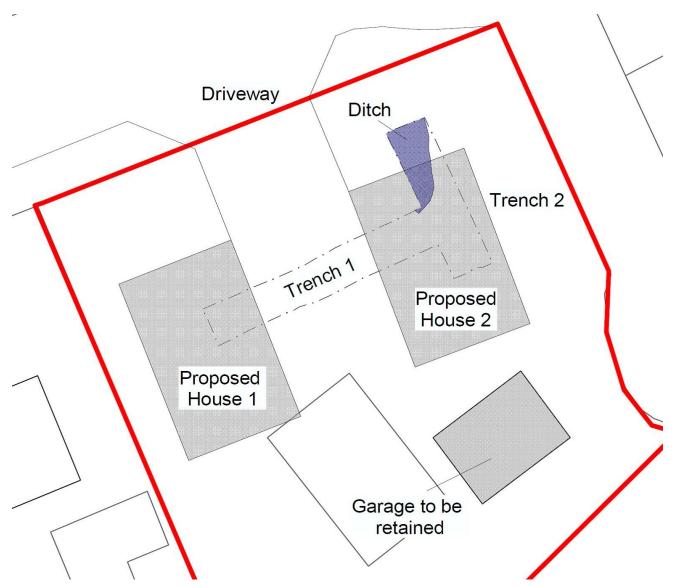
Development proposals overlaid on Trench plan showing location of ditch.
